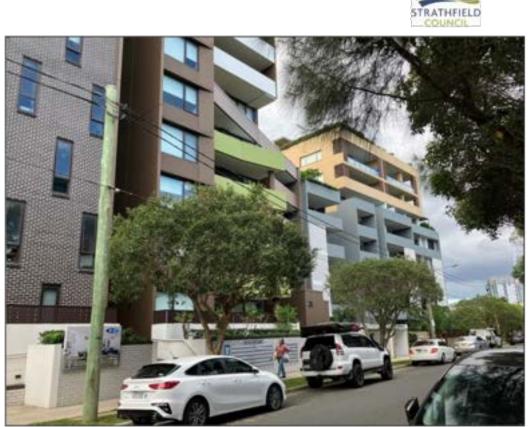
The subject site (Building A), as viewed from Loftus Crescent
